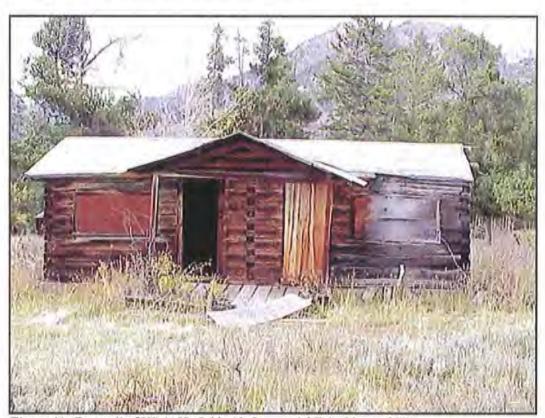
East wall of HS-1158, Cabin 10. Source: A&E Architects, 2004.
